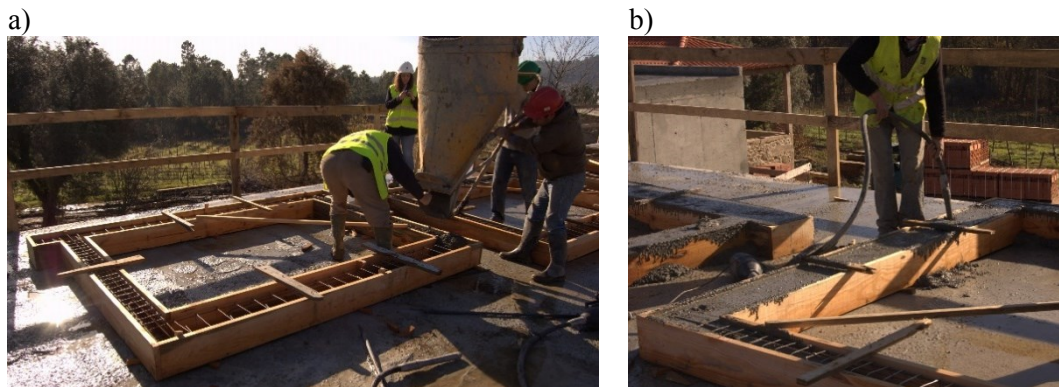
Construction of the frames a) concrete casting b) compaction of concrete by its vibration
